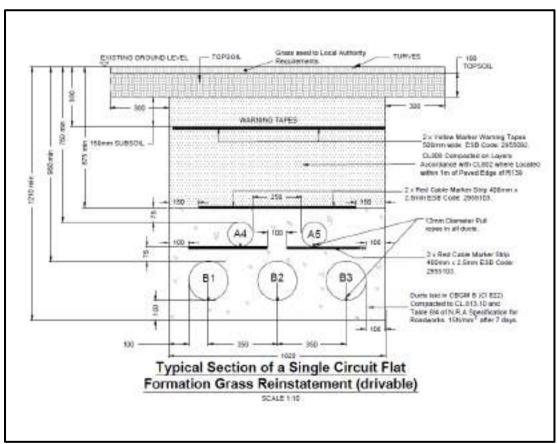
Typical Cross Section of Trench for Underground Cable (Source: CSEA, January 2020)
